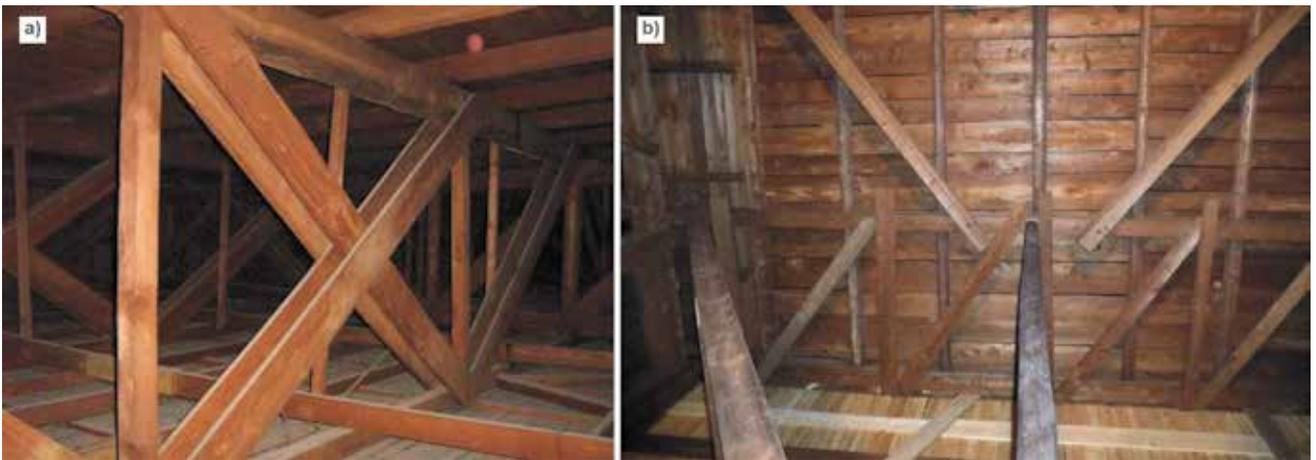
a) Longitudinal truss of the main roof, b) bottom view of the roof bracings
